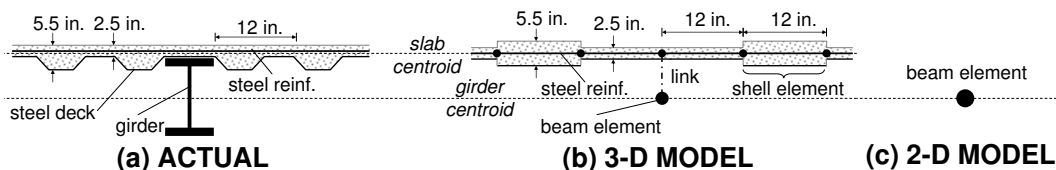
Sections of the girder and slab as represented in (a) the actual prototype building plans, (b) the 3-D FE structural model, and (c) the 2-D FE structural model.
